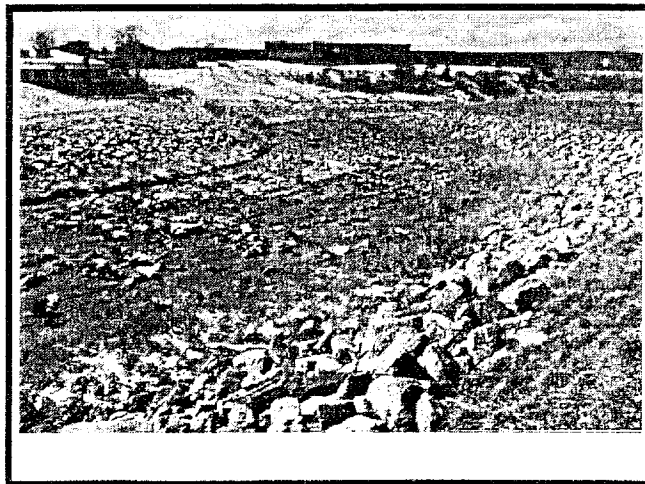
Dumped riprap bank protection, Cottonwood Creek, Colorado.
